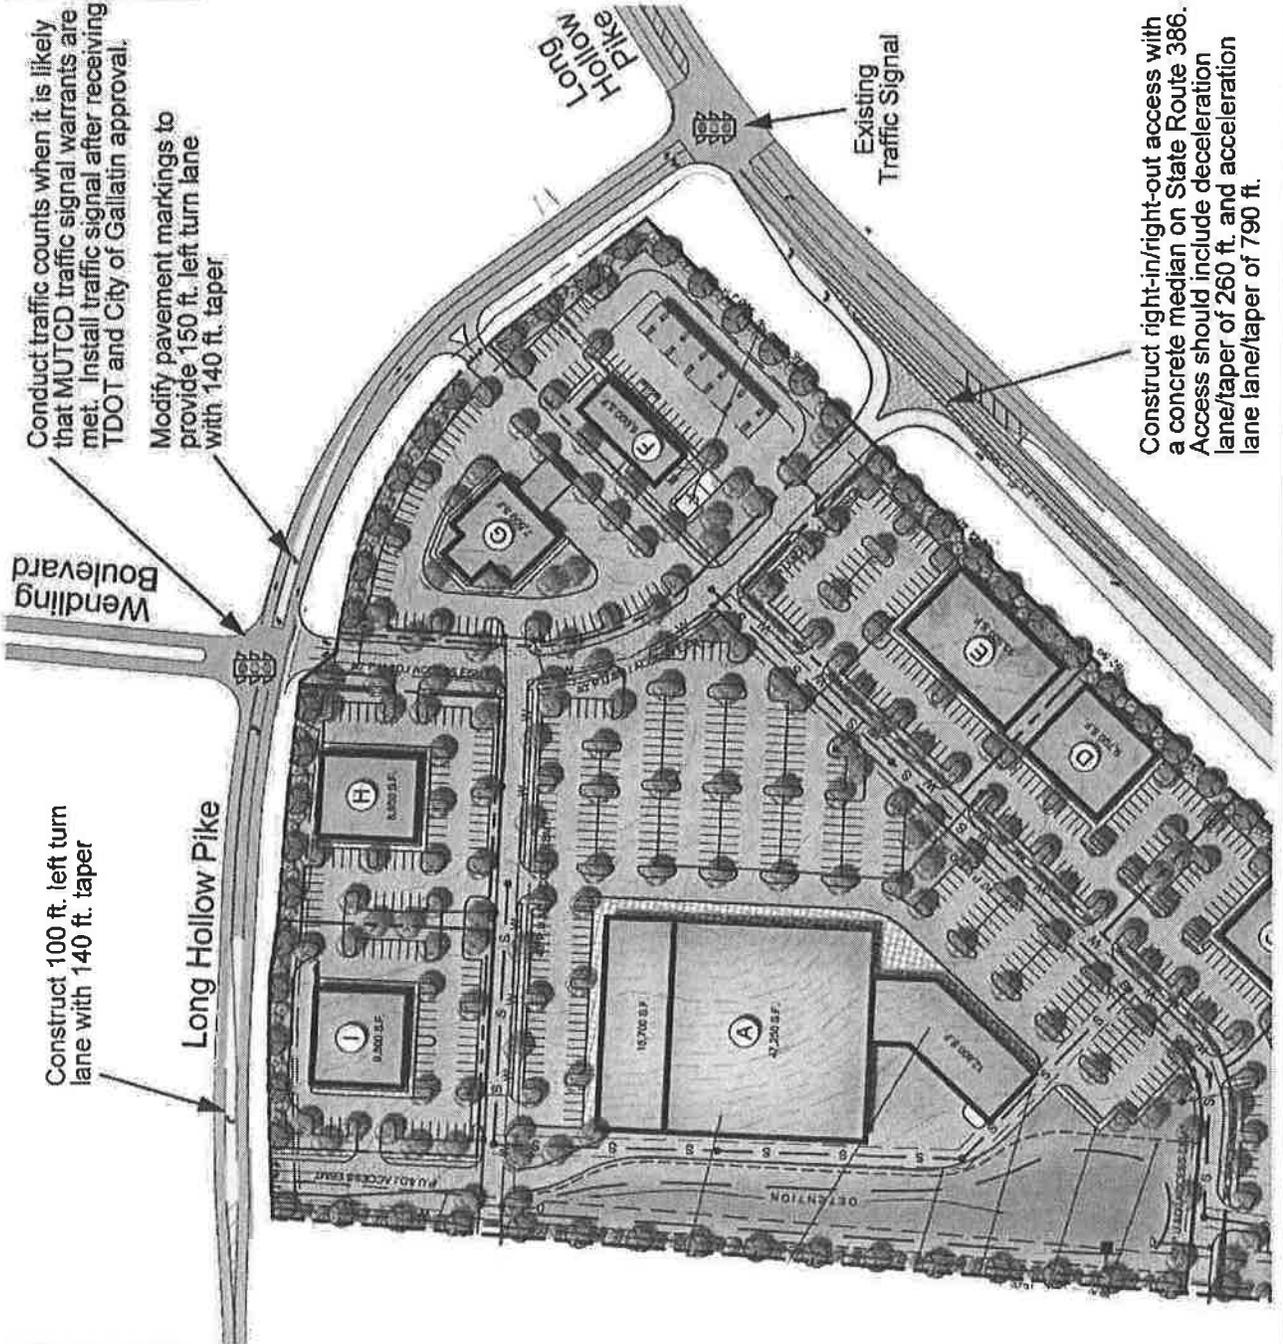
Conceptual Plan for the upgrade of SR-174/SR-386/SR-109 Interchange
